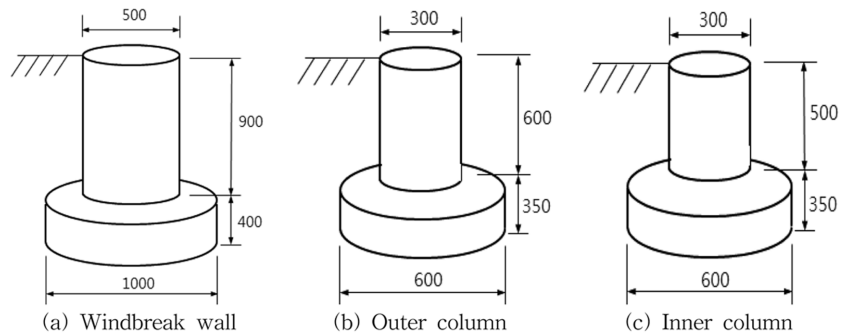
Cross-sectional diagram of footing (unit: mm).
